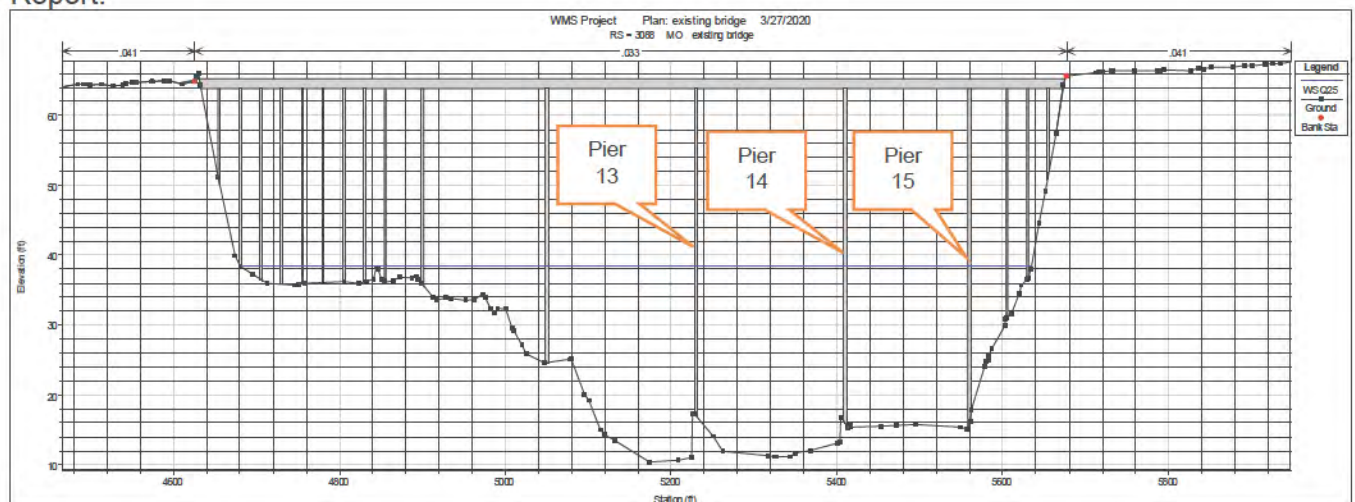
Idealized Hecras Cross section showing piers and water surface elevation for Q100 flow
